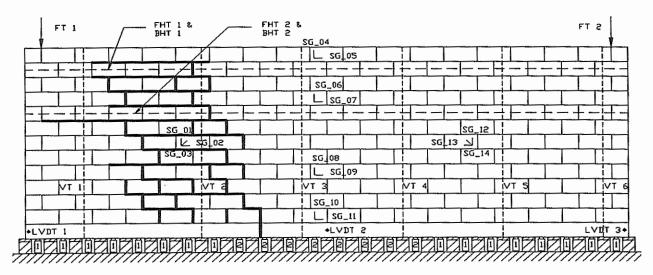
Failure of masonry wall reinforced with vertical and horizontal tendons (HG 5).
